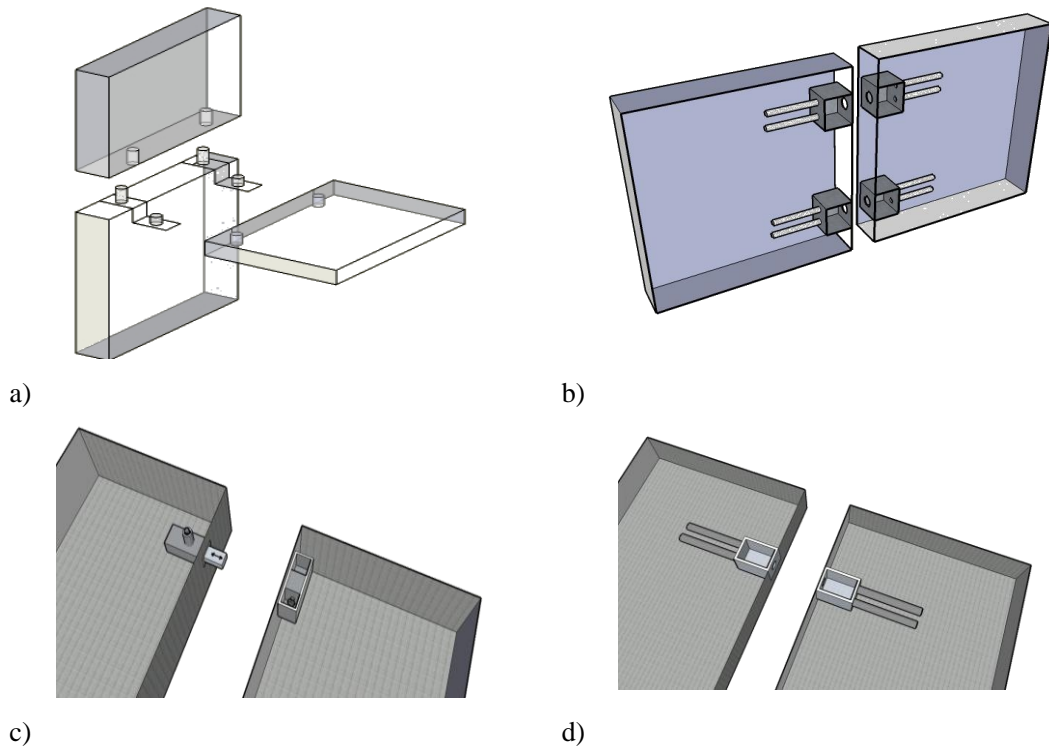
Connection concept 2 a) wall-to-floor b) wall-to-wall c) floor-to-floor d) floor-to-floor, in case of big shear forces
